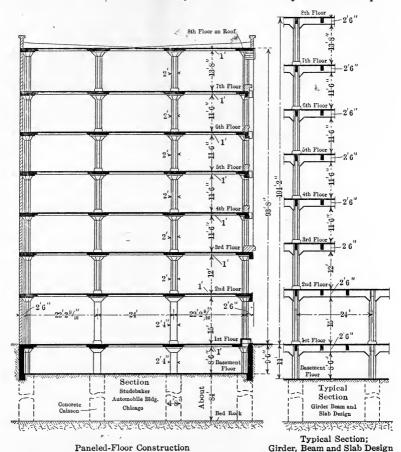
Paneled ceiling, compared with beam and slab design for Stude-baker Co. building, Chicago.
